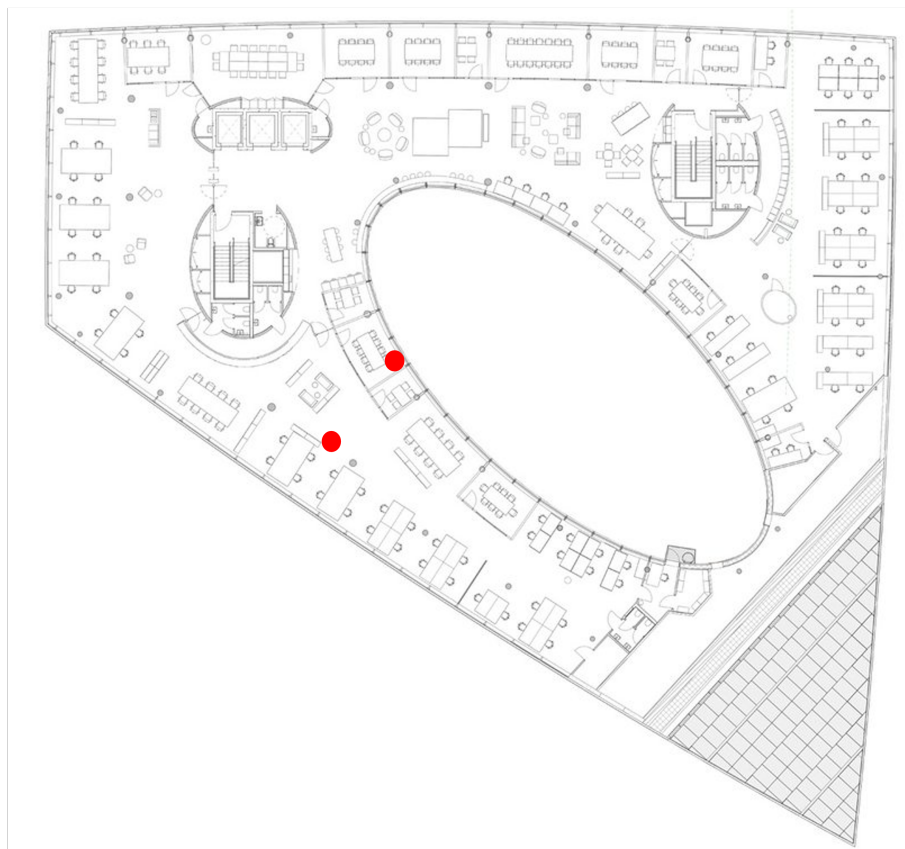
Floor plan of Powerhouse Brattørkaia [80].
